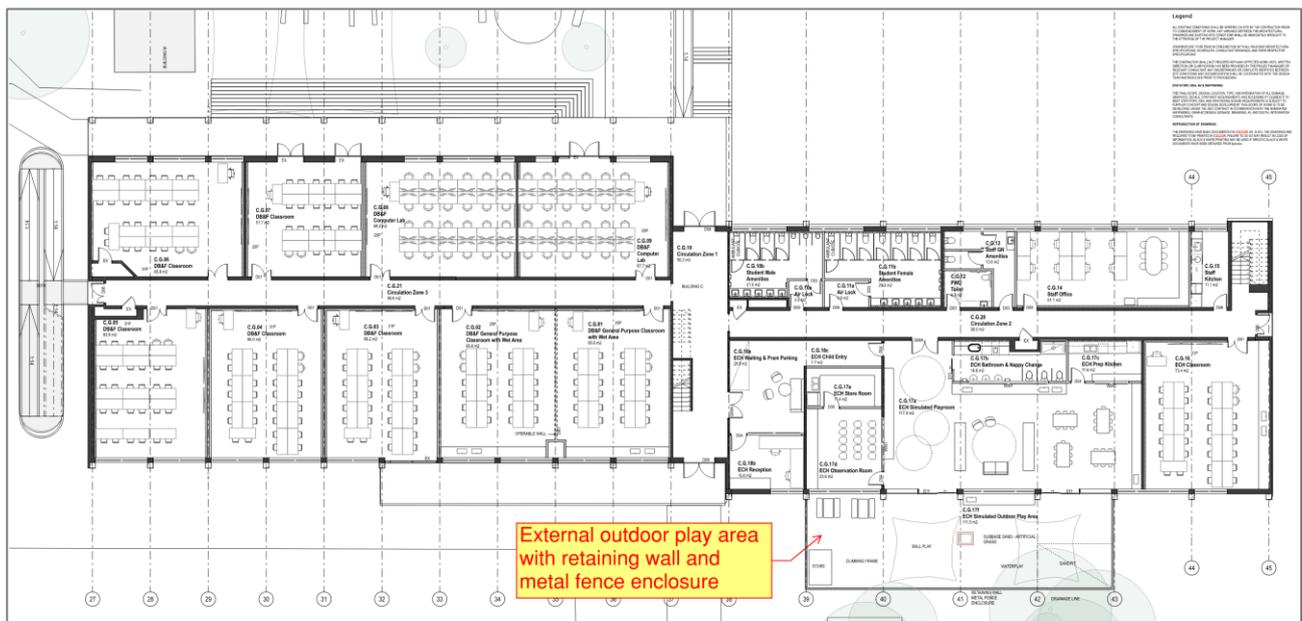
General arrangement plan of the ground floor for Padstow TAFE Building C (fjc studio, 30/05/2025)
